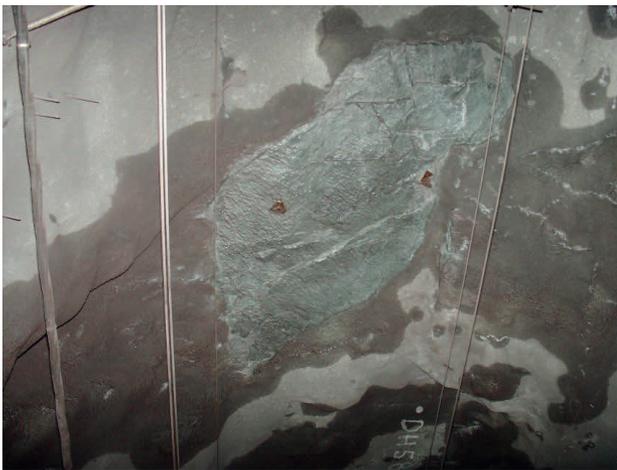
Shotcrete fall-out from 2003 in the roof of the Nuolja tunnel (Andrén, 2008).
